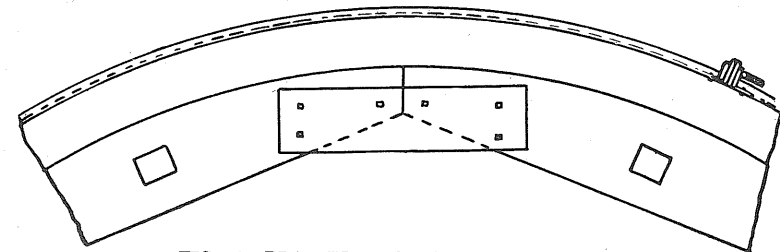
PLAN VIEW OF ASSEMBLED FORM
